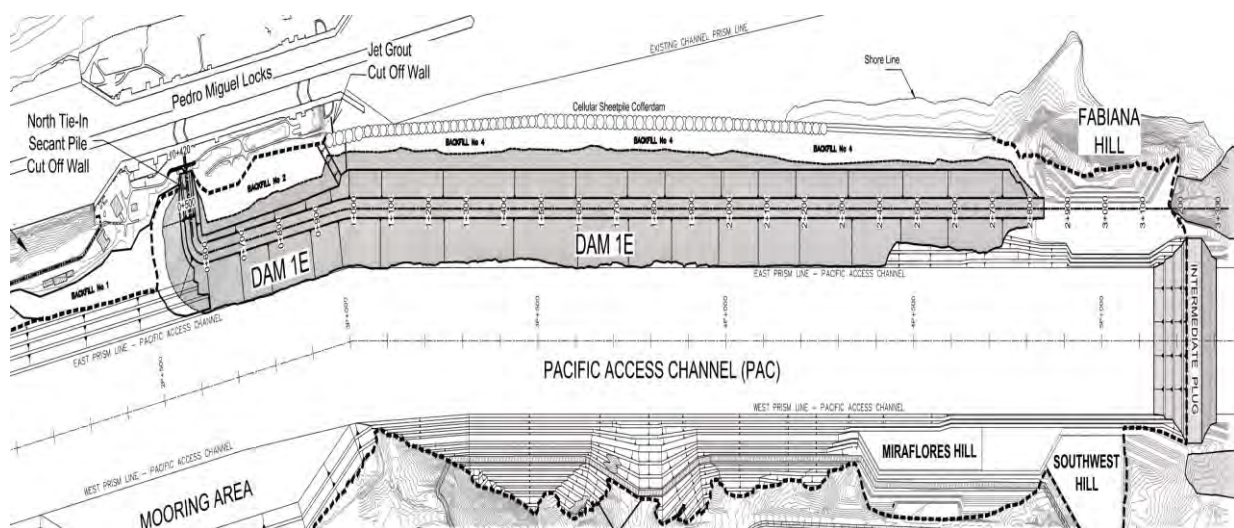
Layout of Borinquen Dam 1E and Pacific Access Channel (PAC)
